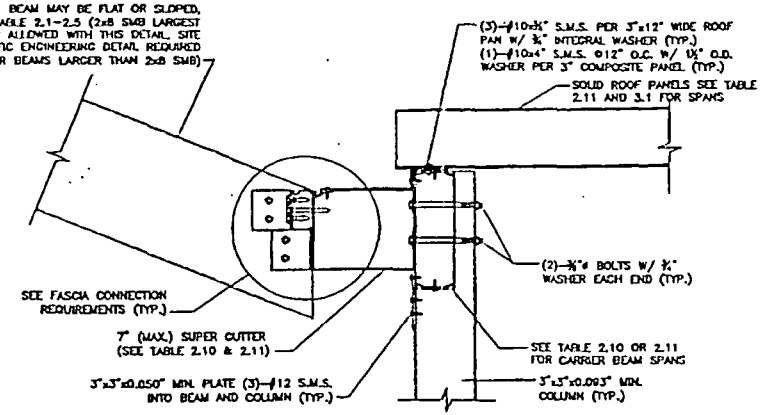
GABLE ROOF TRANSOM (RISER) WALL
